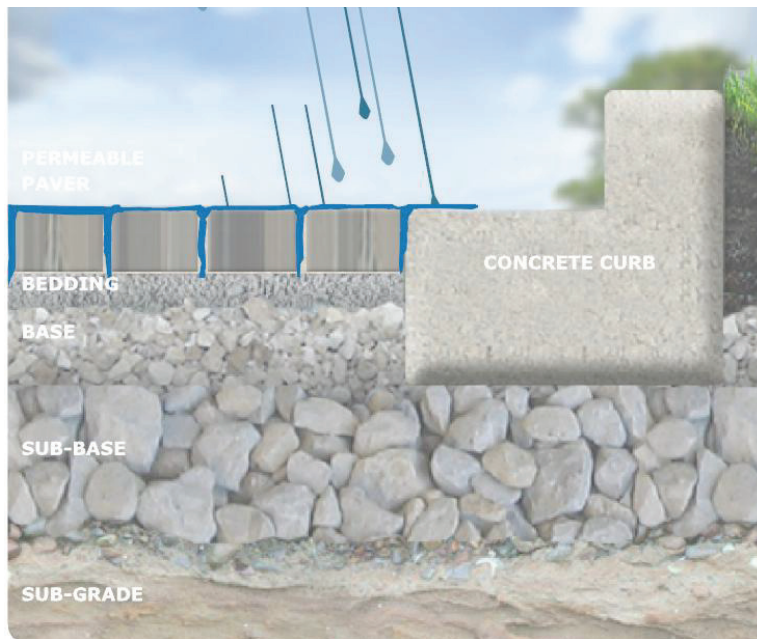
Example of a Permeable Paver Parking Lot Cross-Section (APT, 2011)
